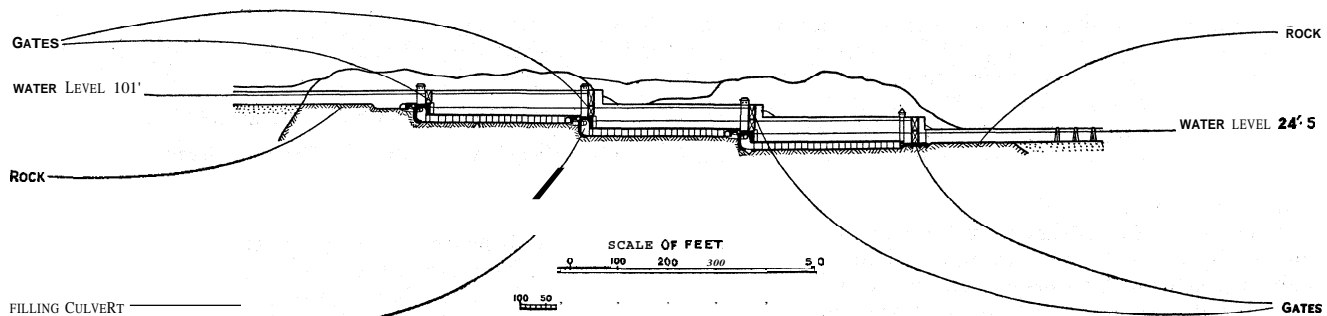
SECTION THROUGH LOCKS ON THE TROLLHATTE SHIP CANAL, SWEDEN
